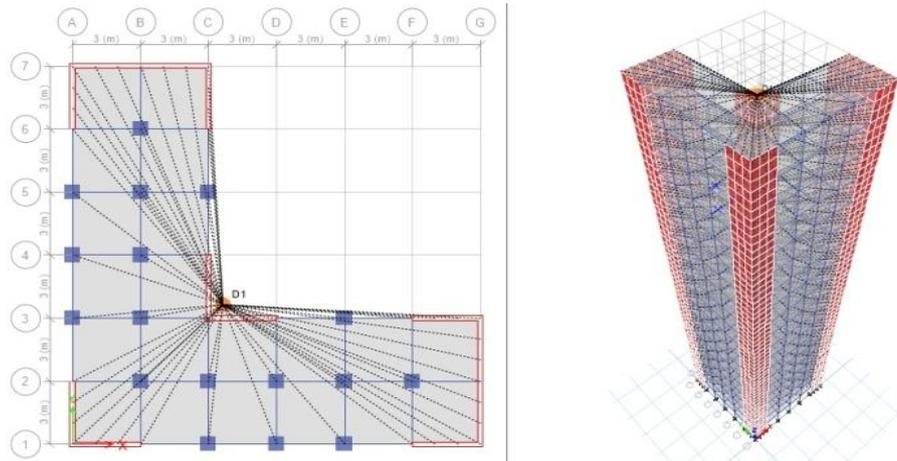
a)Plan of Moment Resisting Frame L-Section building
